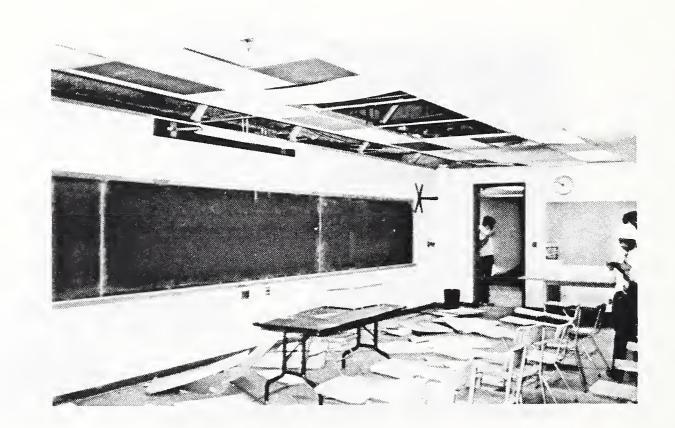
Fallen ceiling tiles in a classroom at the California State University at Los Angeles.
